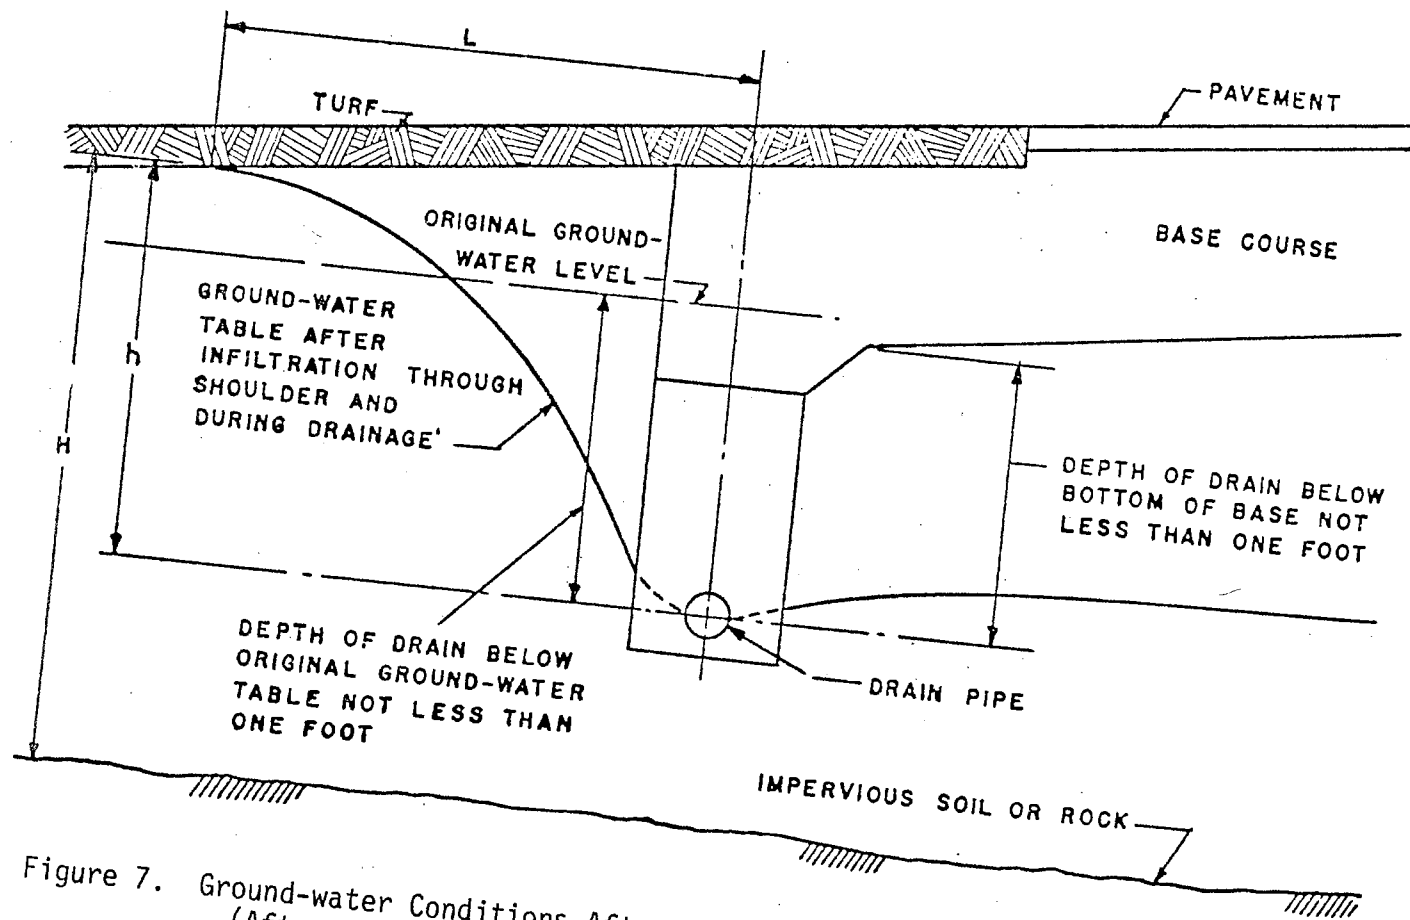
Ground-water Conditions After Installation of Subgrade Drainage
